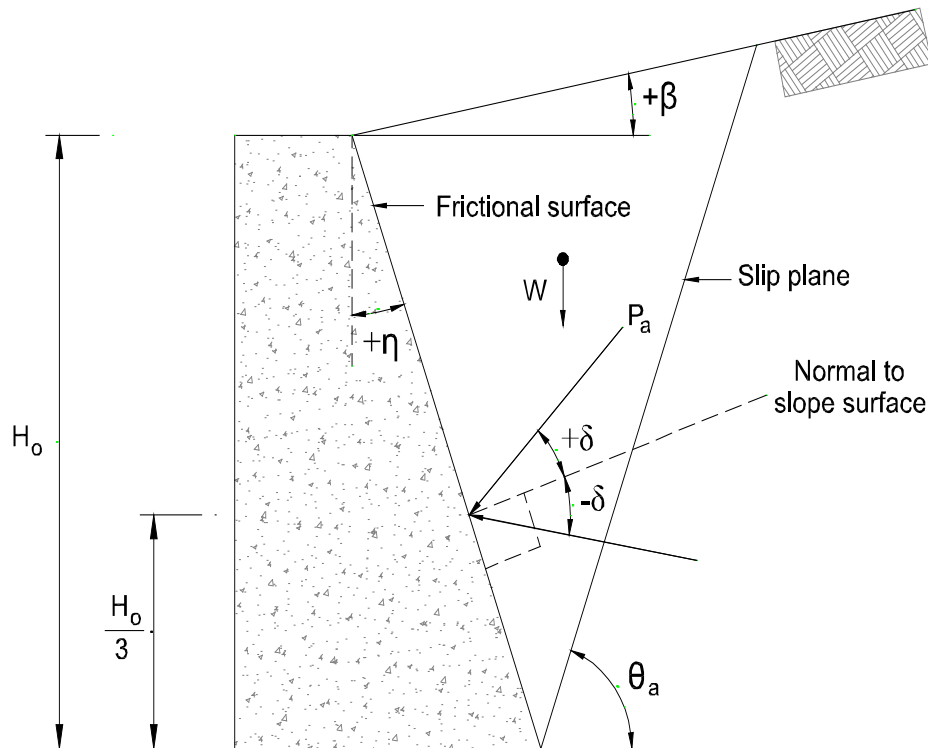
Retaining wall with sloping back, wall friction, and sloping soil surface for use with Coulomb's method for active conditions (adapted from Budhu 2008).
